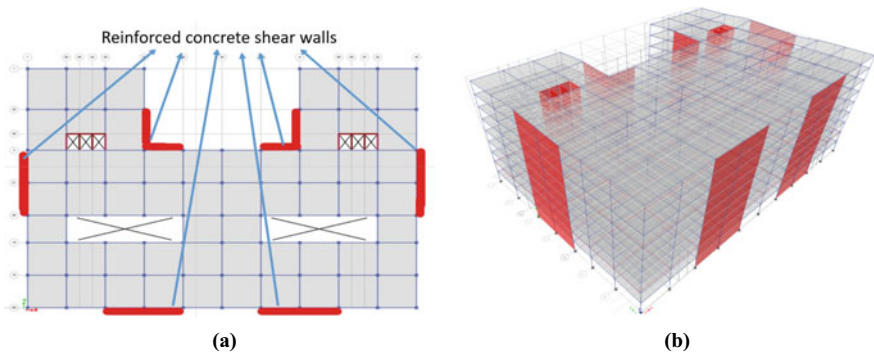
Hospital building retrofitted globally with reinforced concrete shear walls where plastic hinges have developed in structural members due to earthquake loading: a plan and b isometric view
